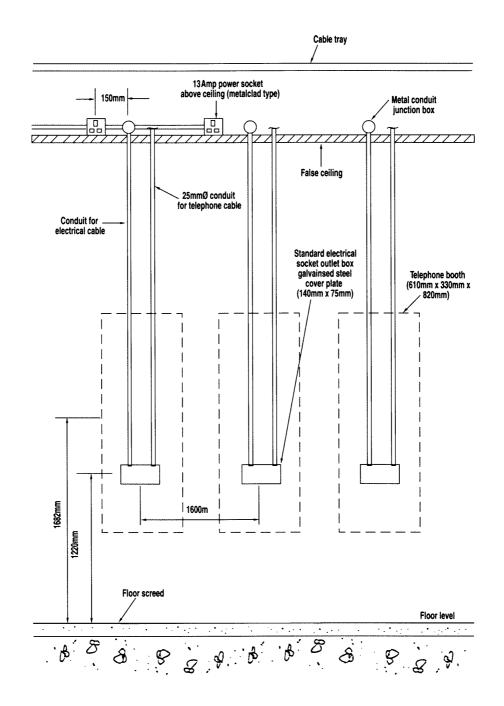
TYPICAL CONDUIT FOR WALL MOUNTED PUBLIC TELEPHONE BOOTH
